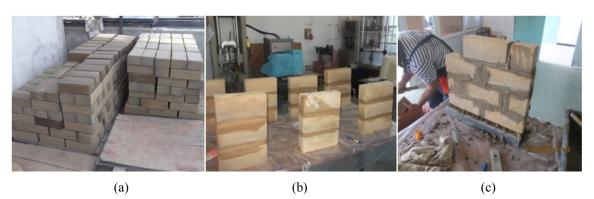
Fabrication earth blocks masonry walls, (a) CSEB, (b) triplets, (c) wall.
